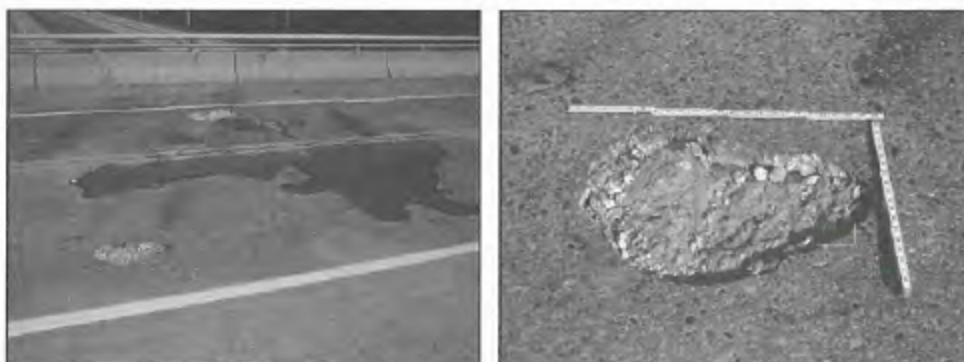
Spalls and Distressed Patches in Span 2 Deck
